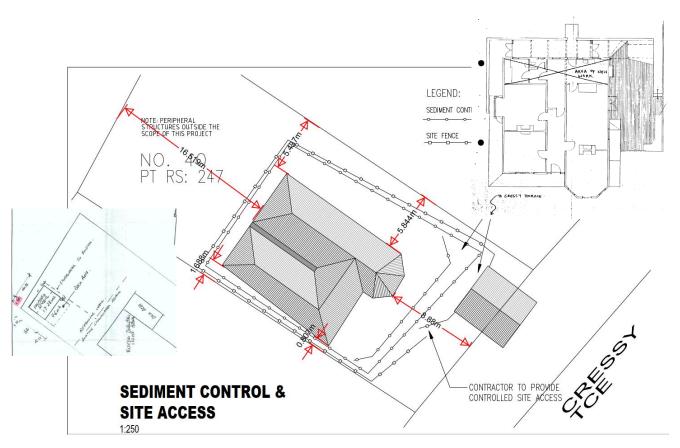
Existing building layout (Source BCN/2018/8380) Note this does not include the large areas of decking visible in the photograph on page 1 of this assessment (refer inset plan for the indicative area of this), or the existing studio in the rear yard (see inset).
